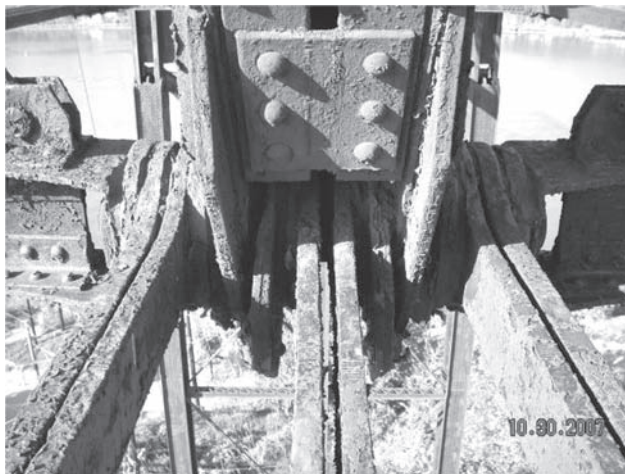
Congestion and pack rust between numerous structural elements at truss panel points made it difficult for inspectors to assess the extent of section loss.
